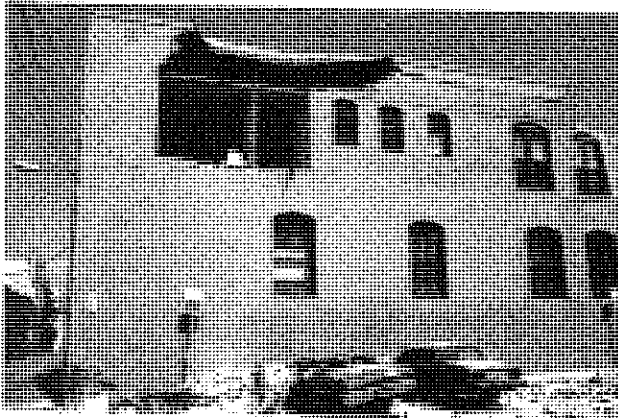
This is a severely damaged URM building. The top portion of the wall at the right is an imminent collapse hazard. This building is considered an *unstable* Unsafe structure, and entry is not allowed.
